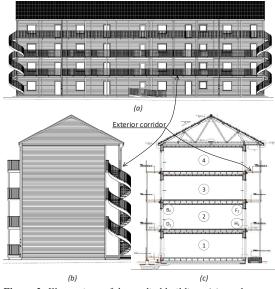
Illustrations of the studied building: (a) northern façade (b) eastern façade and (c) section of the building.
